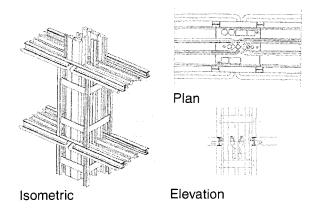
Isometric, Plan and Elevation of the Scheme Design Core. With all services preinstalled. Prefabricated Cores.
